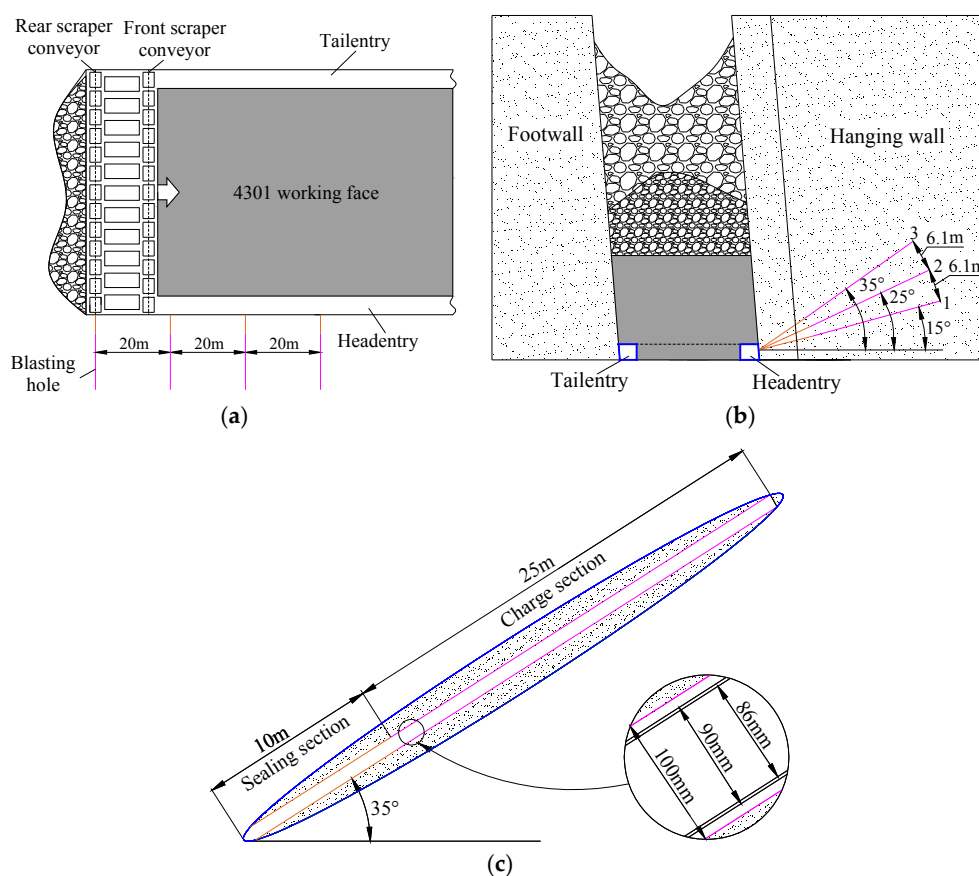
Layout of blasting hole. (a) Plan of the blasting hole; (b) Profile of the blasting hole; and (c) Detail structure of blasting hole.
